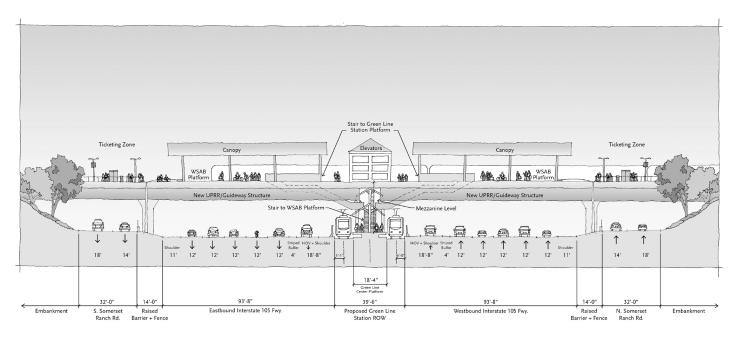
Conceptual crosssection drawing (looking west) for a New Metro Green Line Station below a new WSAB Station at Florine Ave. and Century Blvd. in the City of Paramount
